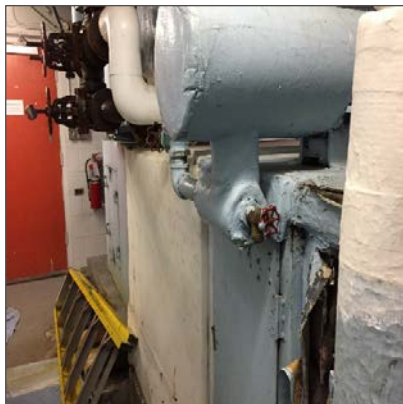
Asbestos-containing parging cement on pipe fitting, fair condition, Mechanical Room 1, East Basement of Middle Wing.
